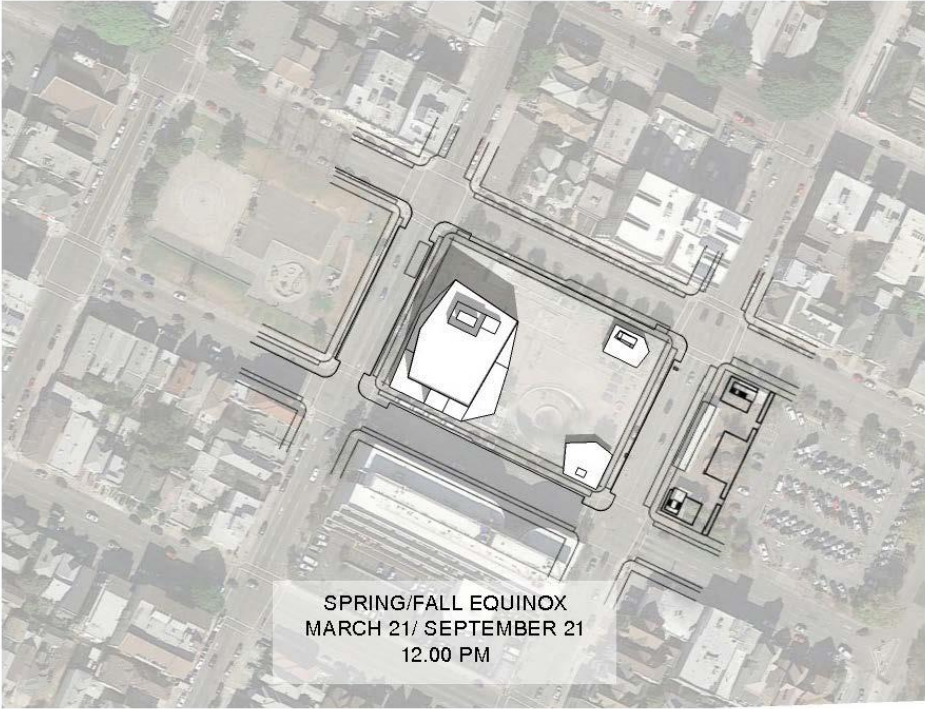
Shadows cast by the proposed TOF building on spring/fall equinox at 12 noon.
